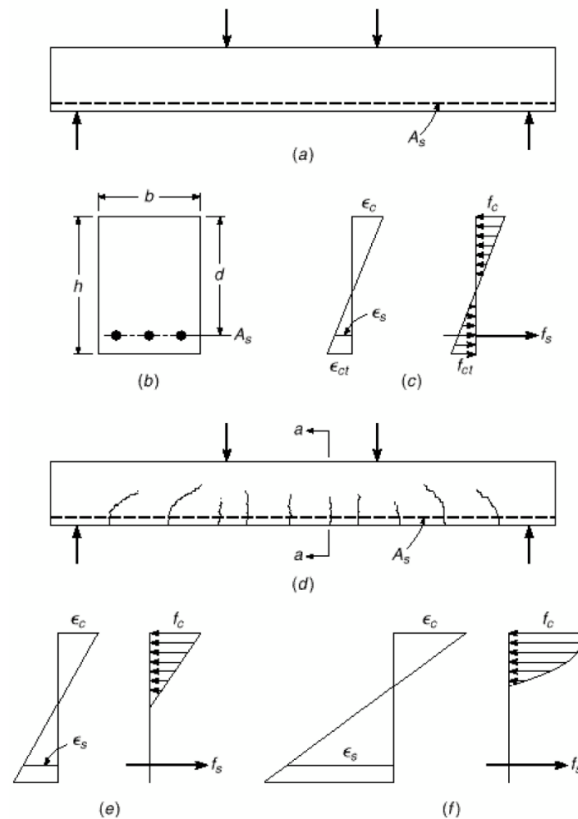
Typical sectional behavior of a cracked section within a reinforced concrete section. Extracted from Nilson (2011).
